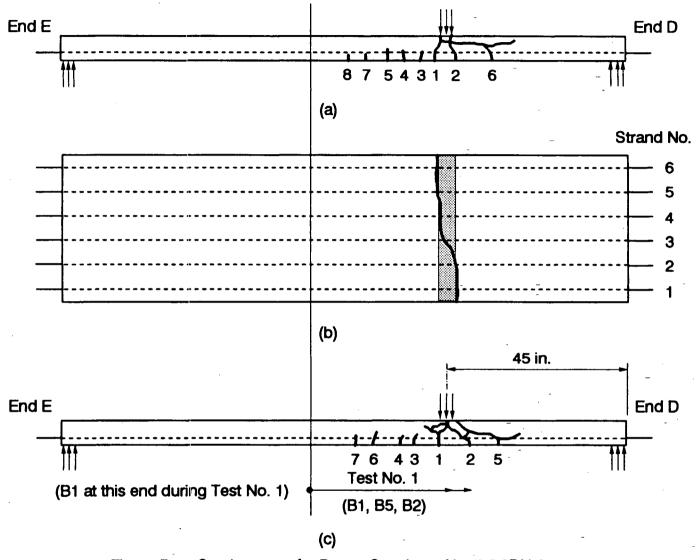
Crack pattern for D-type Specimen No. 7-6.0DU-3:
